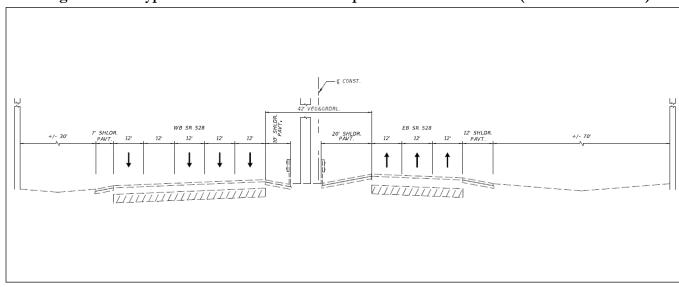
Typical Section at SR 528 Underpass at Goldenrod Road (Structure #750512)
